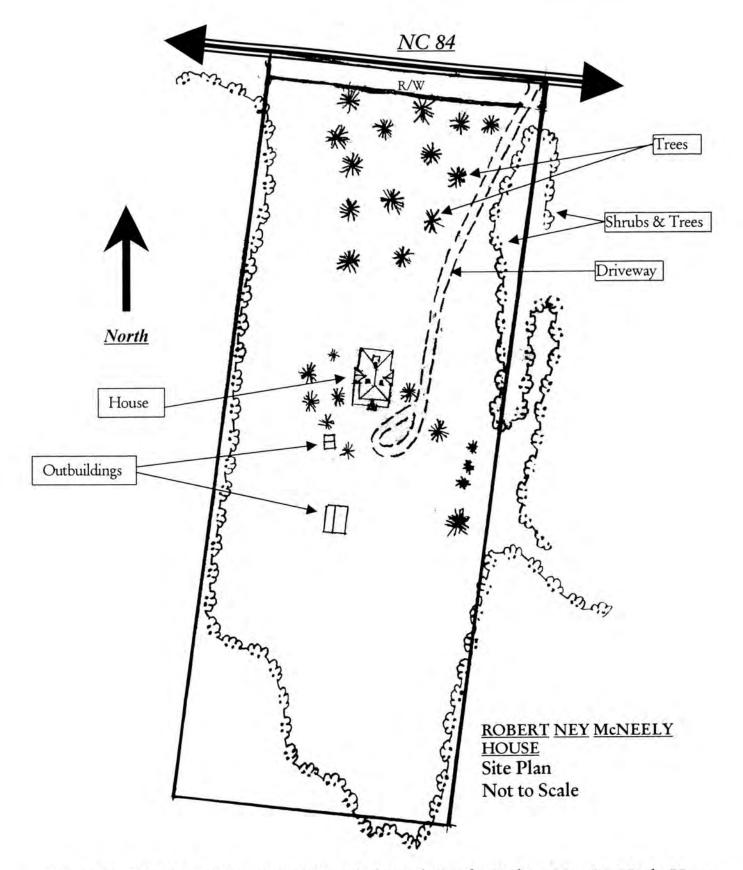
Site plan and proposed historic boundaries for Robert Ney McNeely House (Property # 16)
